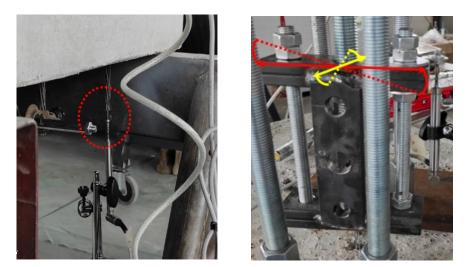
Setup A imperfections on the passive side (left) and active side (right)
